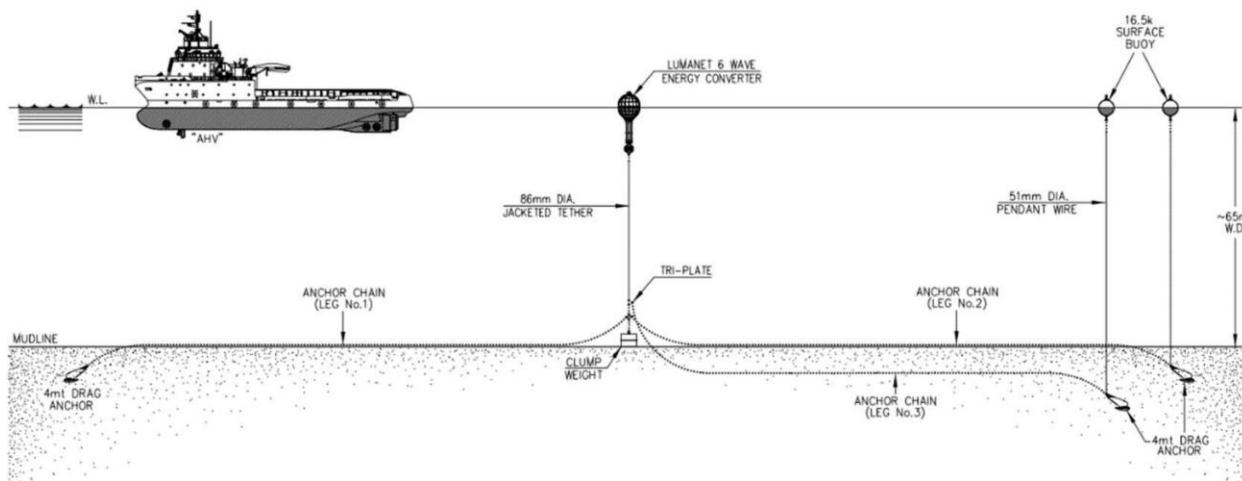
Drawing from the Installation Plan showing the WEC after installation is complete.
